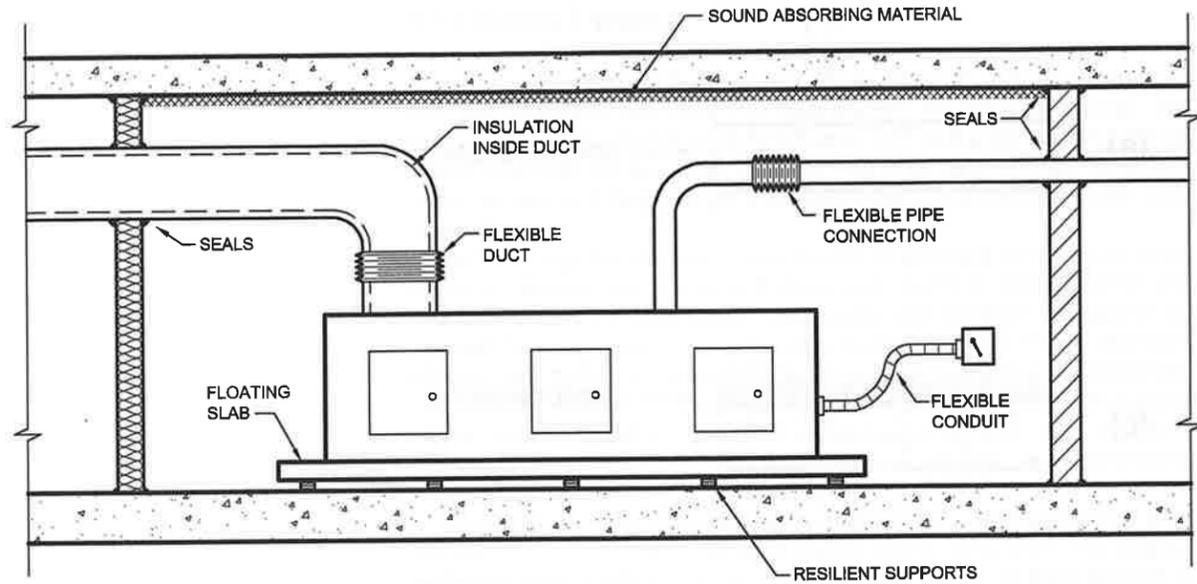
Because even the least noisy mechanical equipment makes much noise, the mechanical equipment room should have sound-absorbing material on the ceiling and the walls. Also the ceiling, floor, and walls should be designed to have low sound transmission. Vibrating equipment is often mounted on a floating slab resting on a continuous cushion or on resilient supports such as springs. All ducts, pipes, and conduits must have a flexible section to prevent structure-borne sound transmission, and all penetrations of the room's envelope must be carefully sealed.
